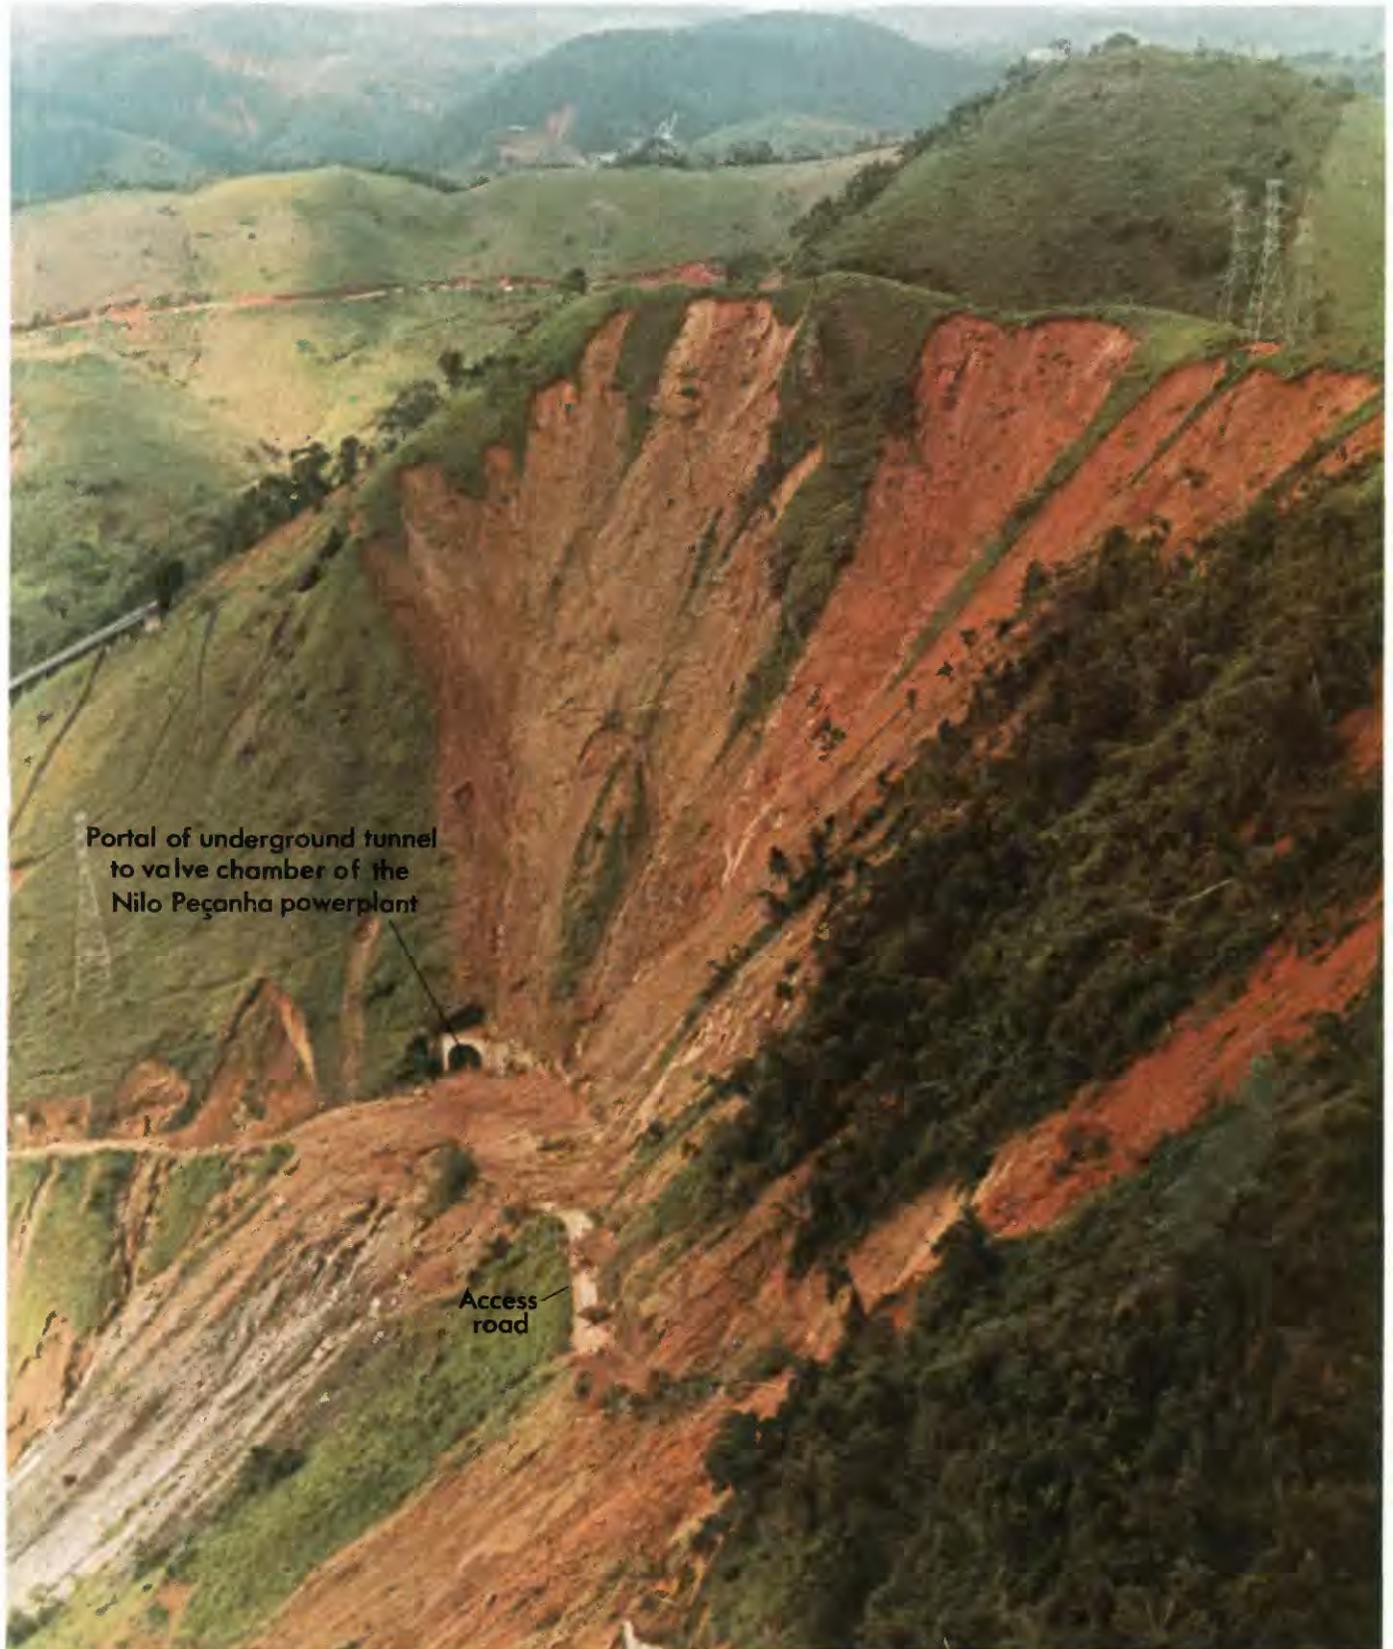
Landslides covering access road to tunnel leading to underground valve chamber of Nilo Peçanha powerplant. A slide cut to within 1 m of the base of one of the transmission tower foundations, upper right.
